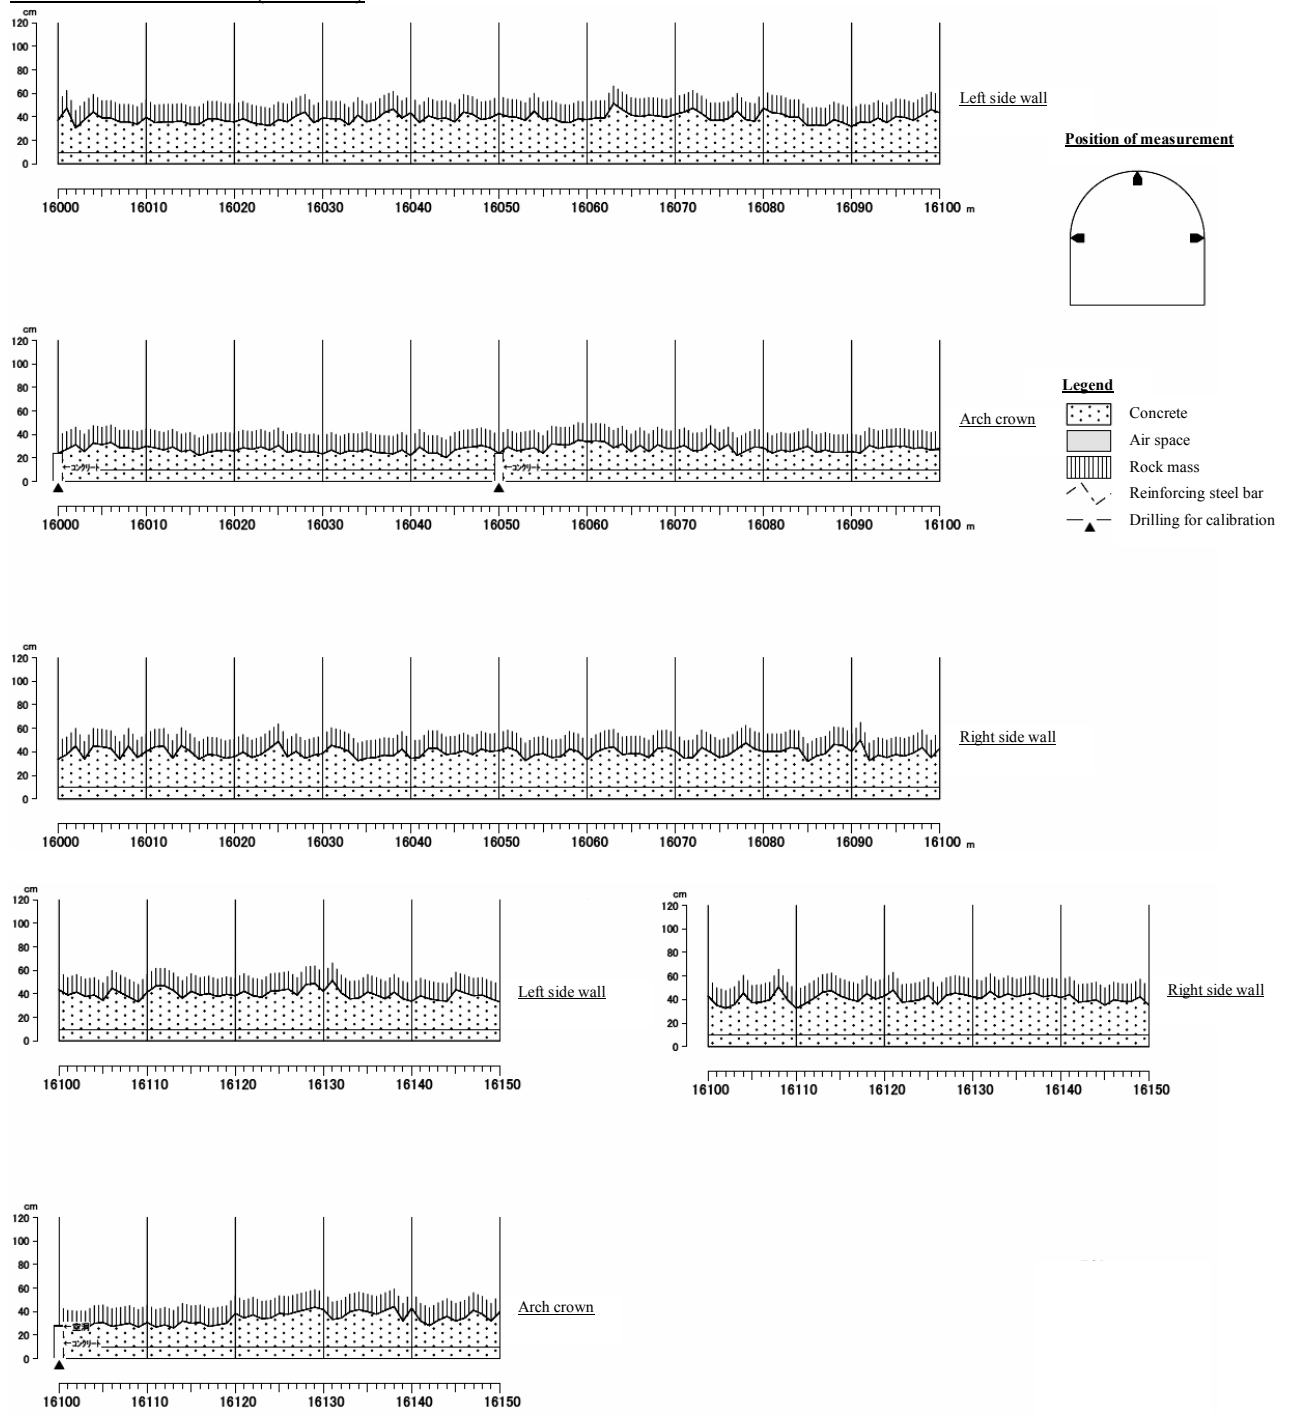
Investigation of Cavity behind Concrete in Old Tunnel (3)
